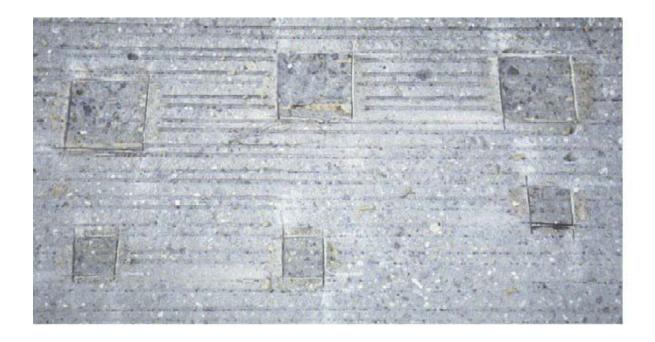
Failed Surfaces Using 2-in and 4-in Square Plates
